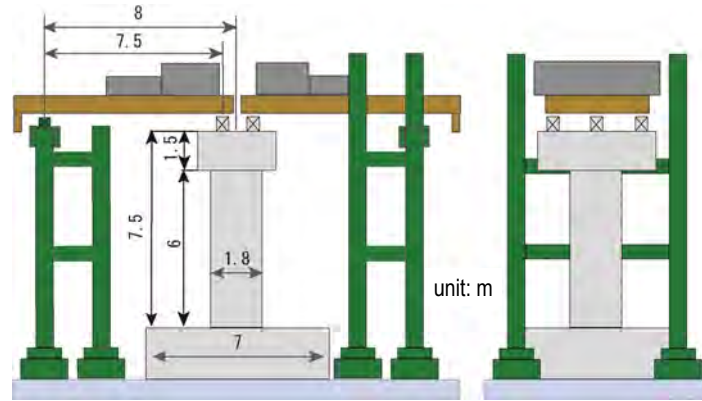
Schematic view of C1-1 Reinforced Concrete Bridge Pier.
